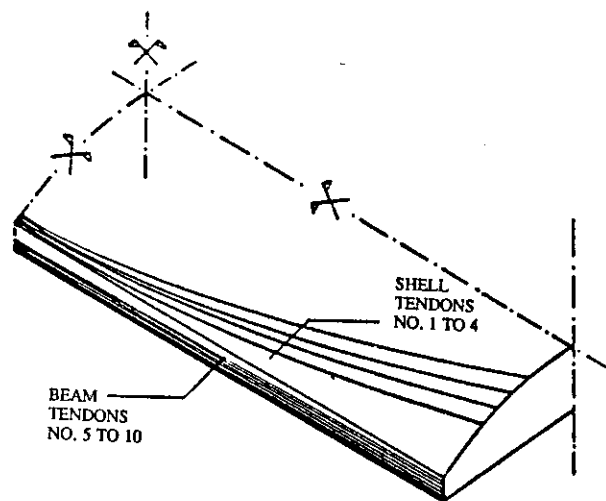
Ex. 2. Prestressed Tendons in Shell and Edge Beam.
